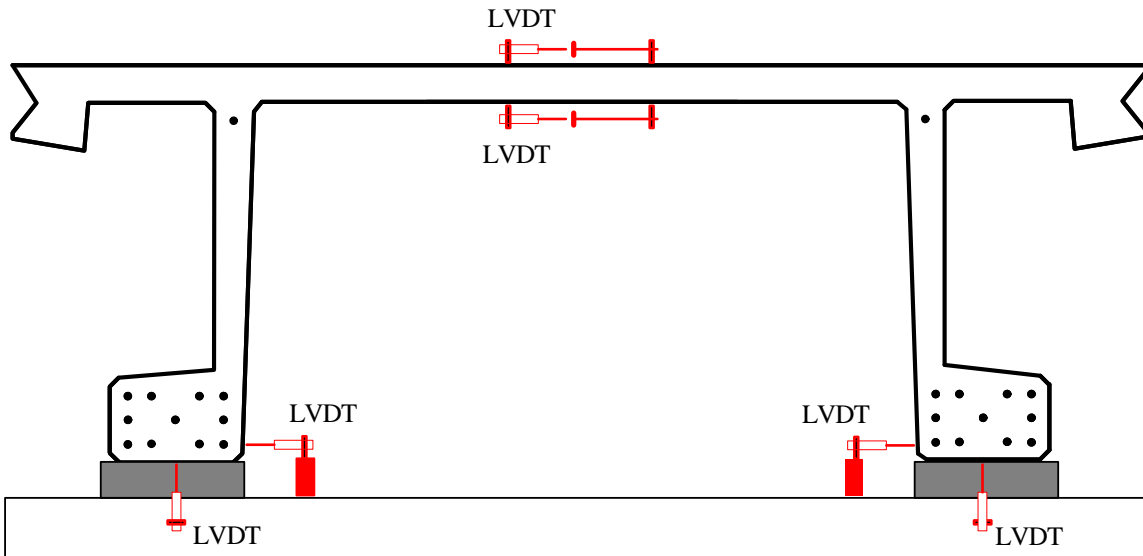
Illustration. Abutment LVDT locations for Test P4-24T and Test P4-24D.
